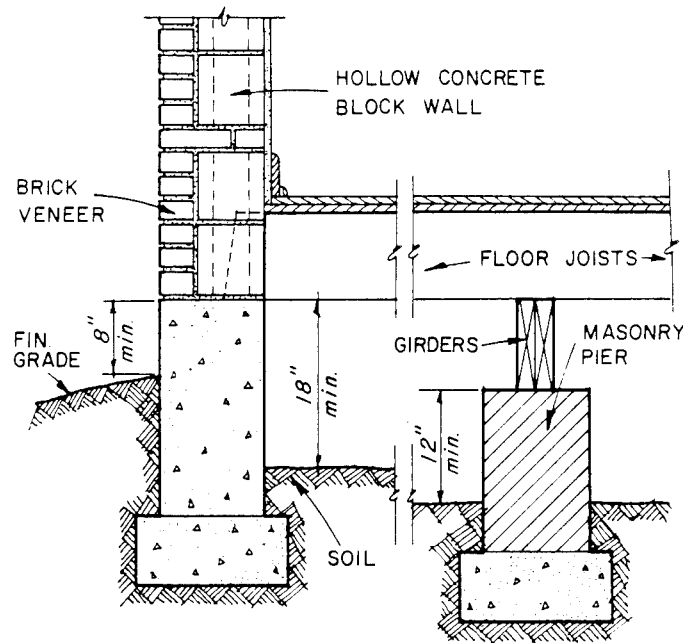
Where the superstructure of a building is masonry, provide for adequate clearance between wood and ground both outside and inside the building (adapted from USDA).
